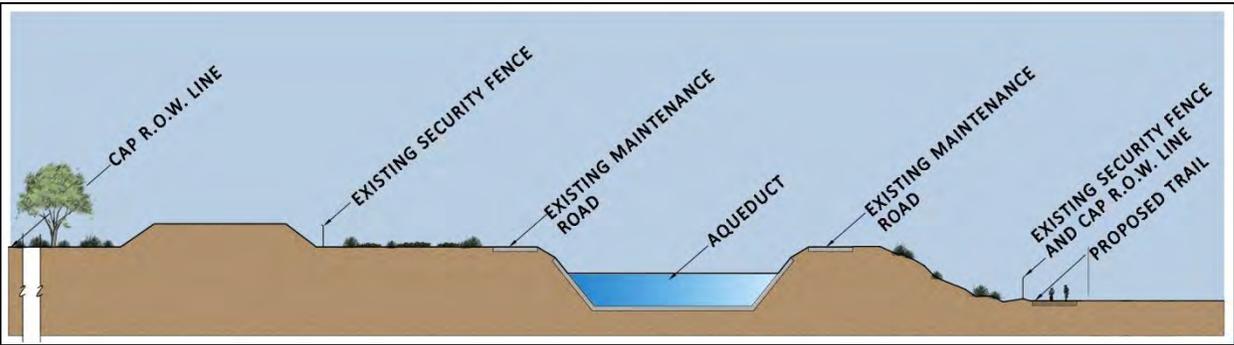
I: Cross-Section PIC-4 – Typical of Mile Post 10.1 to 12.0
